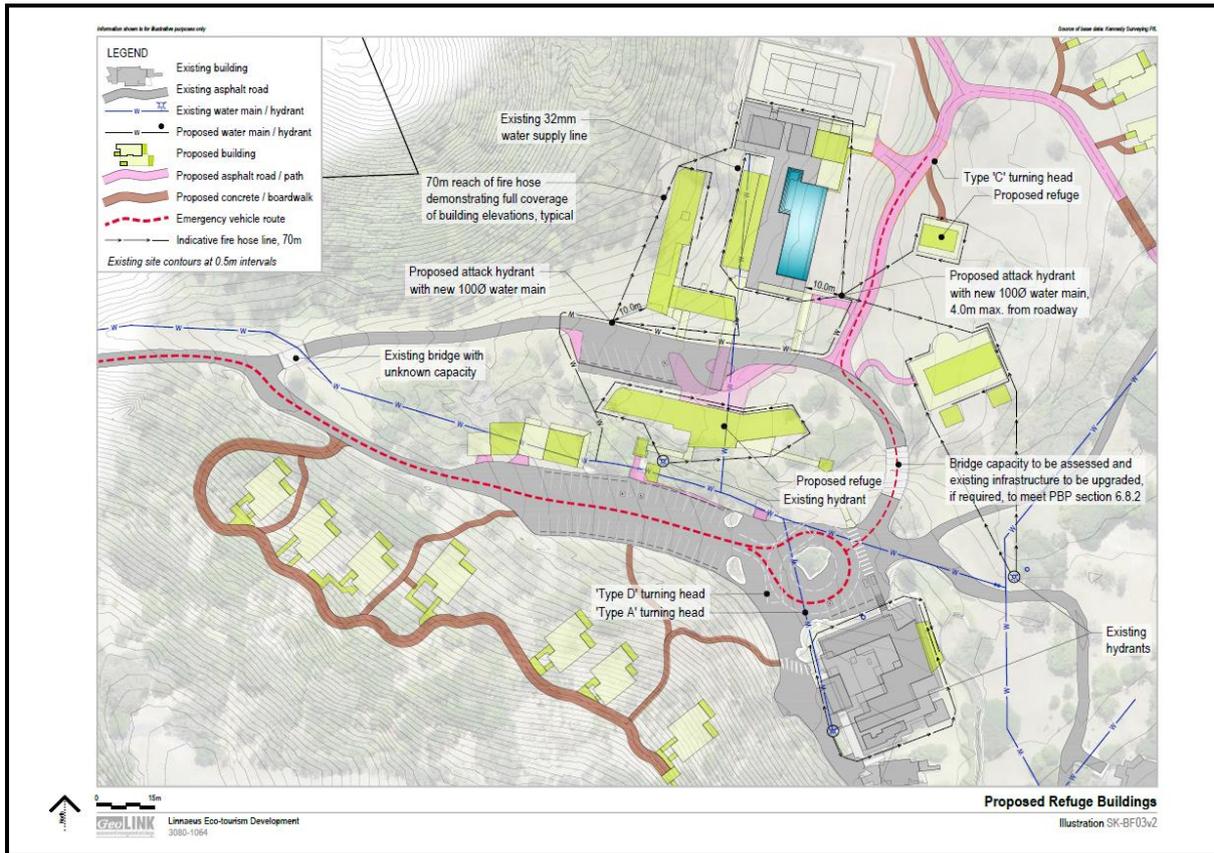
Internal property access road providing appliance access and turn around adjacent to the proposed refuge buildings.
